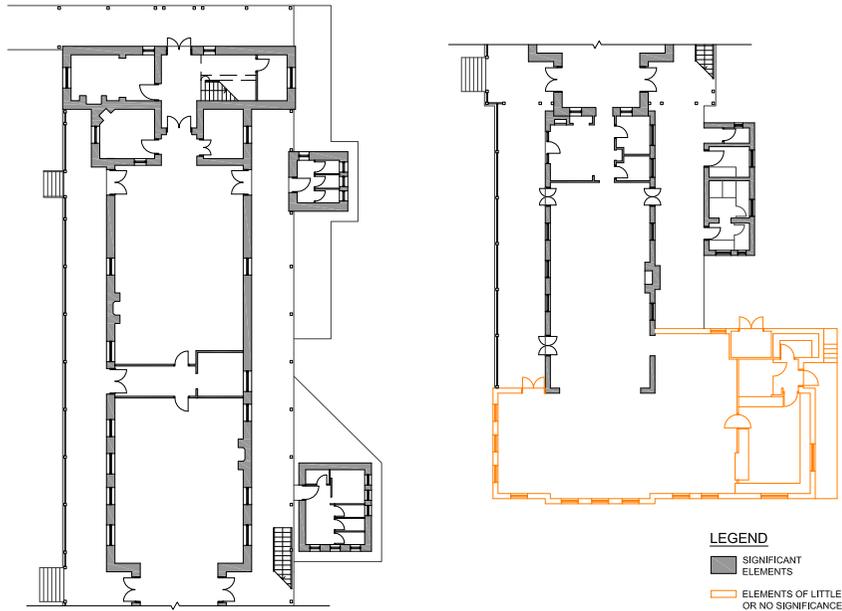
E - CROWLEY HOUSE GROUND FLOOR
